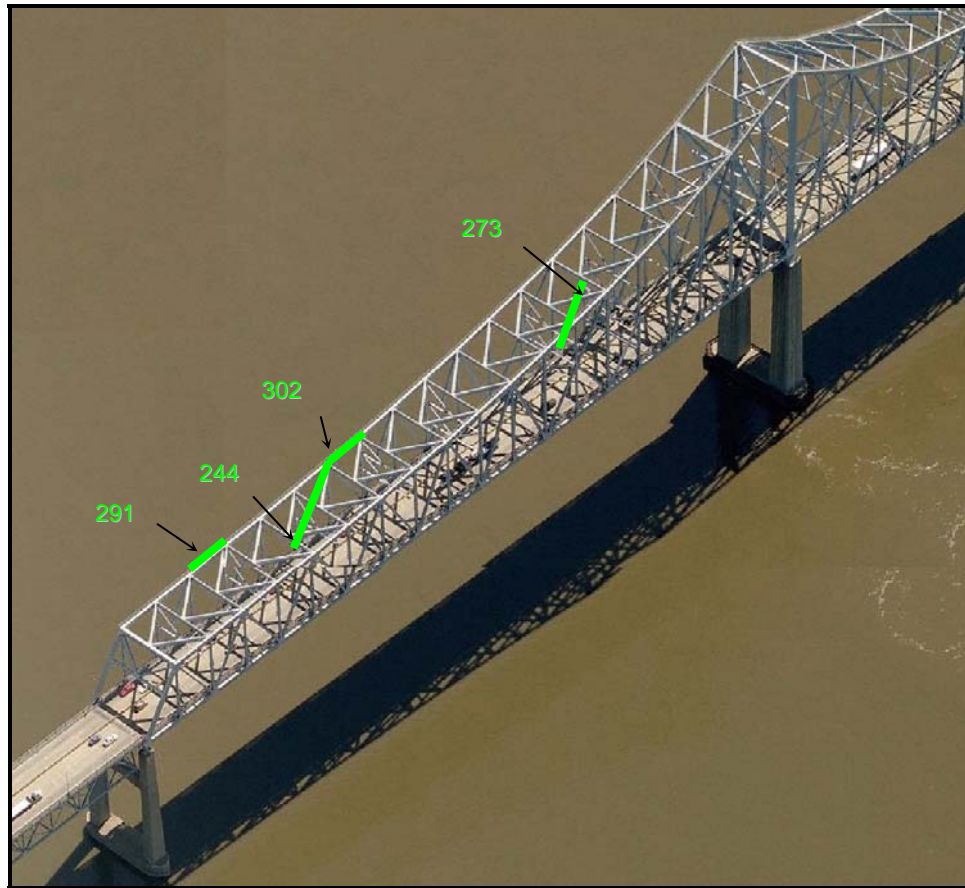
View of Pennsylvania back span looking upstream showing instrumented truss members (*green = upstream; yellow = downstream*)
